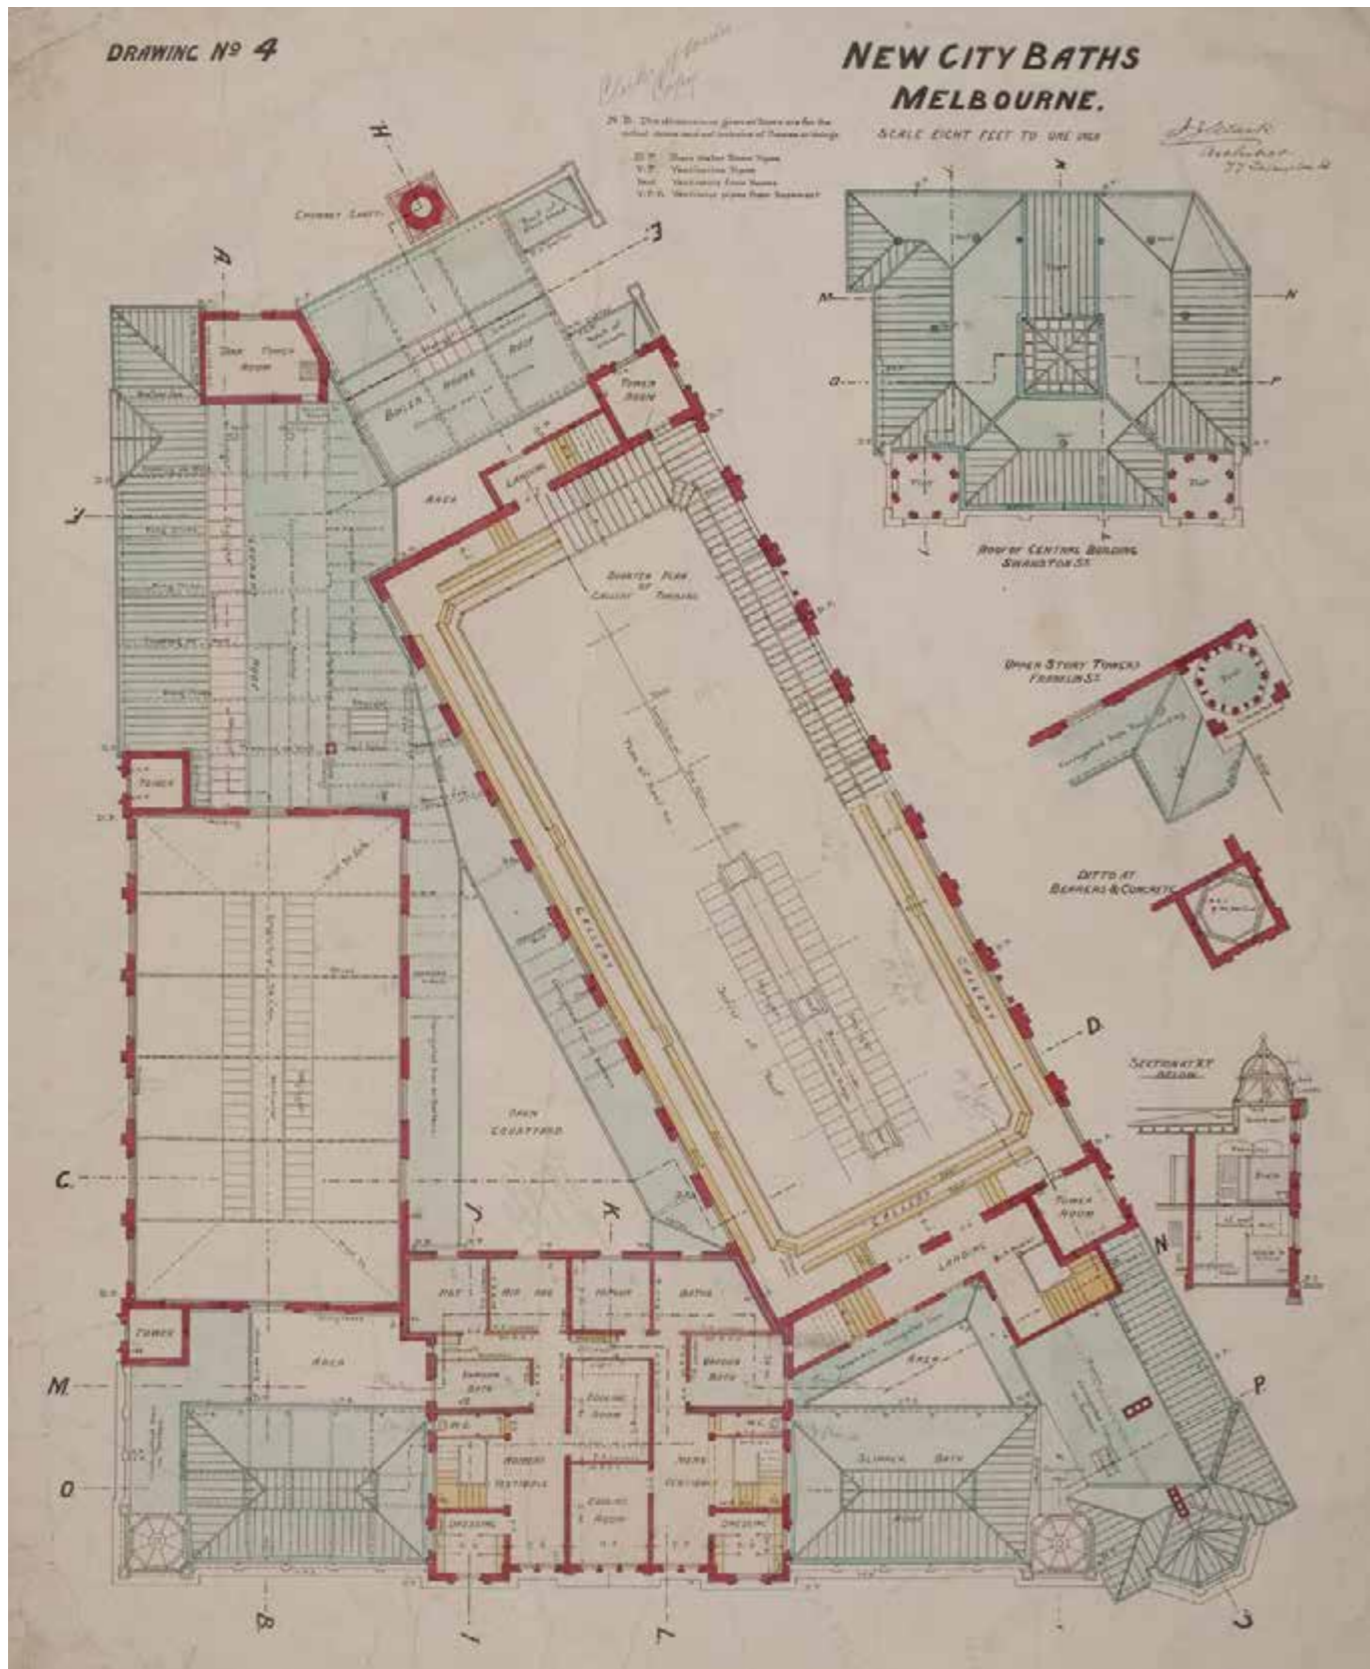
Drawing no. 4, First Floor and Roof Plan, New City Baths Melbourne, 1904
